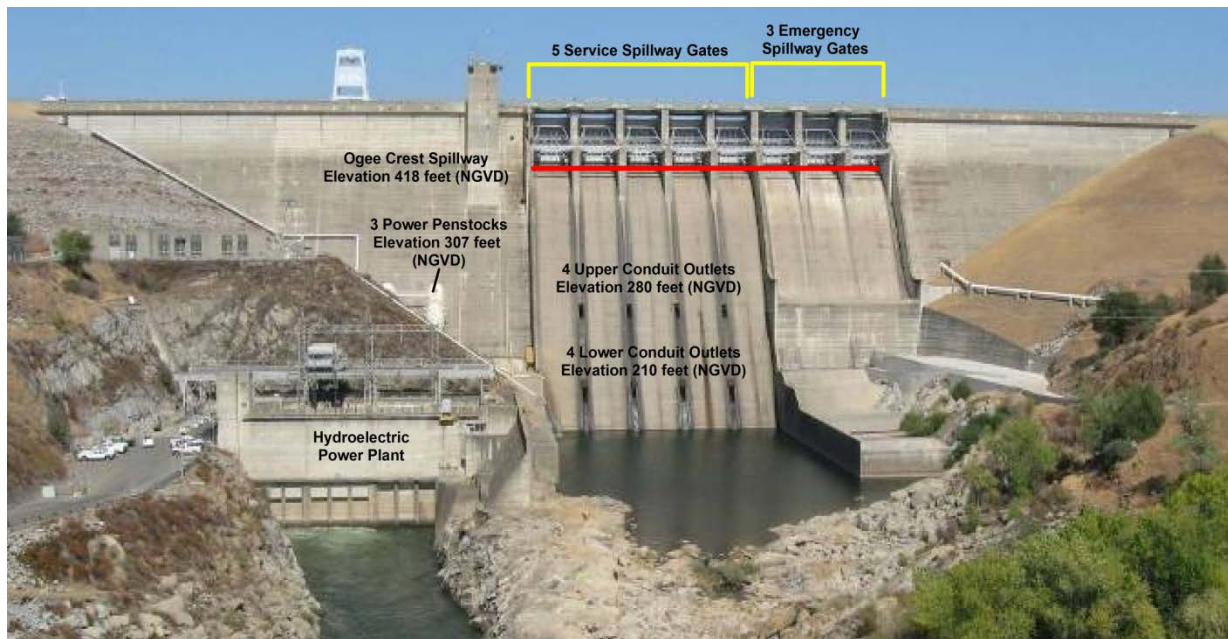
Concrete Gravity Section of Folsom Dam.
